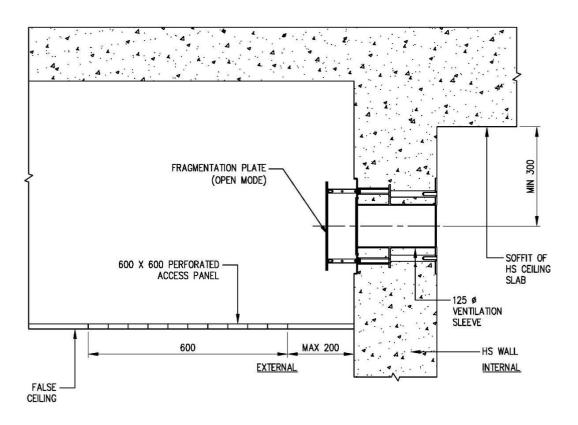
(b) SECTIONAL VIEWS OF VENTILATION SLEEVES
